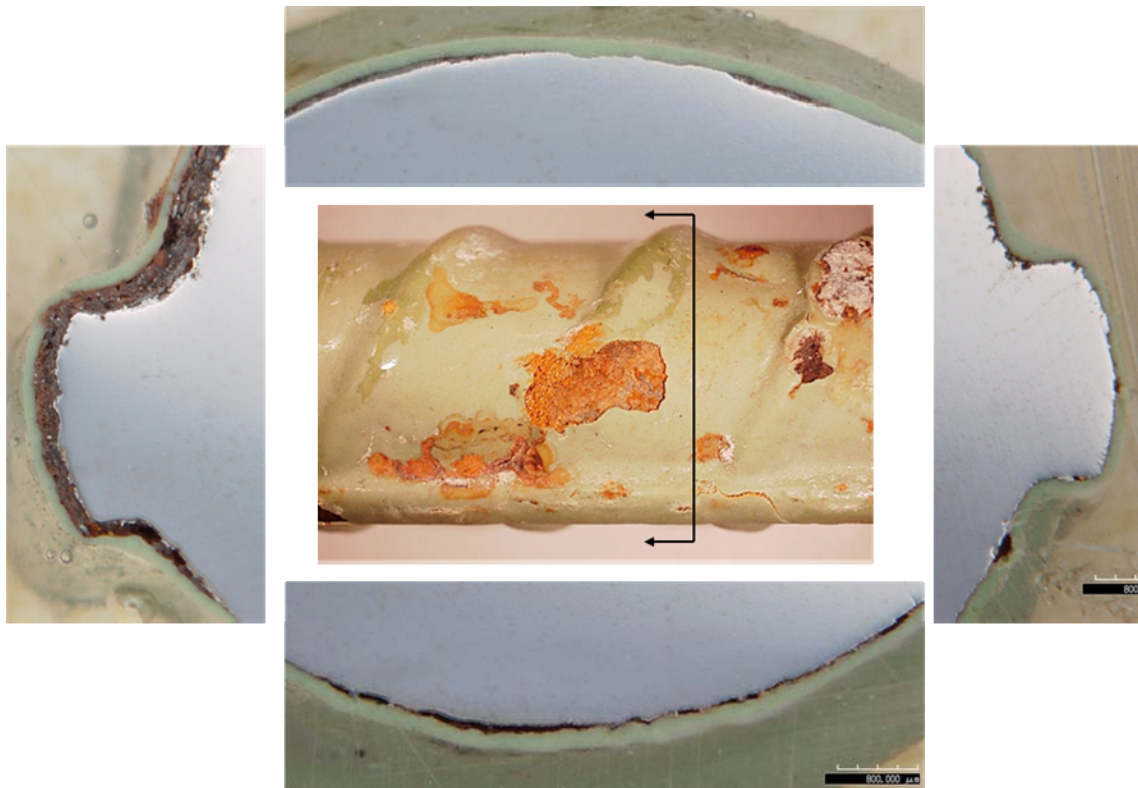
A cross-section through an intentionally damaged area along bar-3 of specimen EP-D-2.
